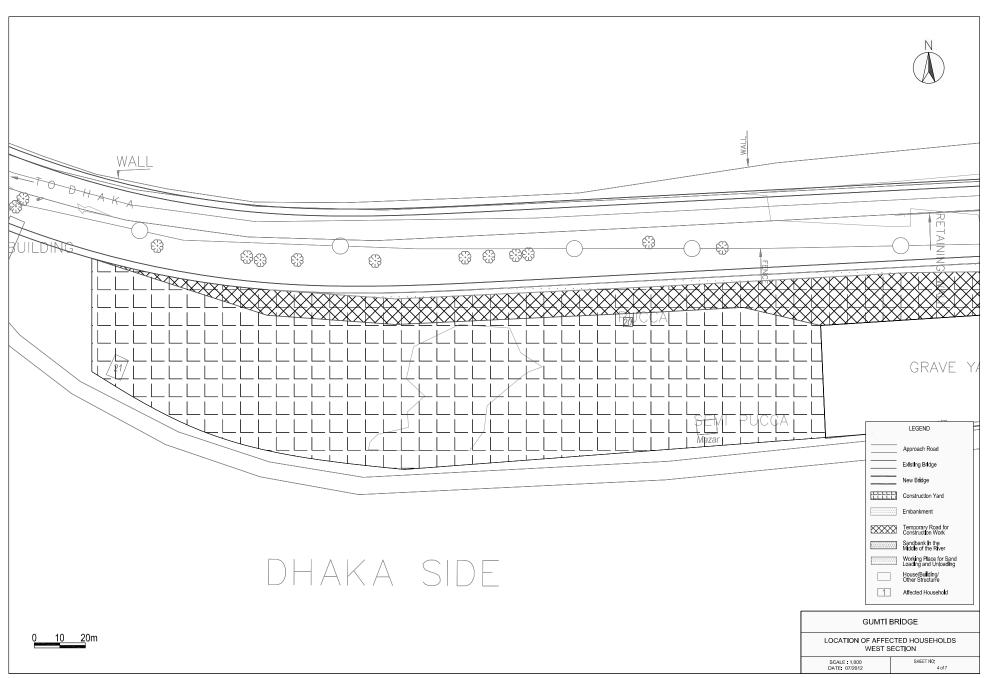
Location of Affected Households West Section (Sheet No.4)
